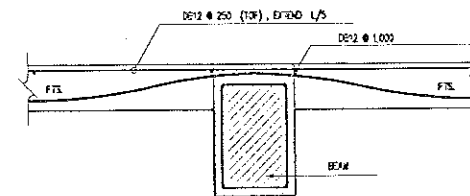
REINFORCEMENT AT CONSTRUCTION JOINT
